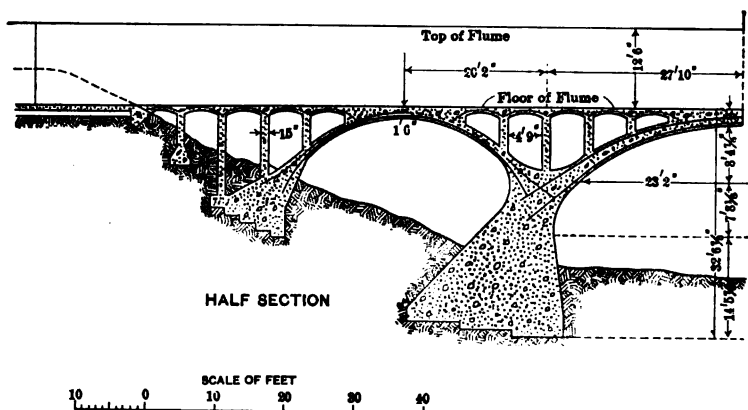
Half Longitudinal Section, Reinforced Concrete Aqueduct, Interstate Canal, Nebraska-Wyoming.
